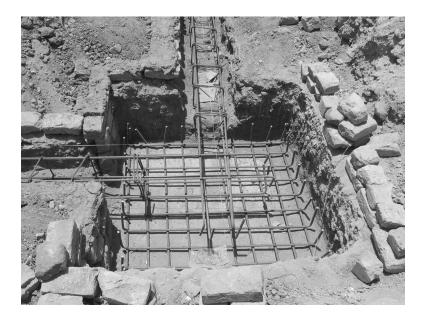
Steel reinforcement in spread footing, 60 m² structure.
